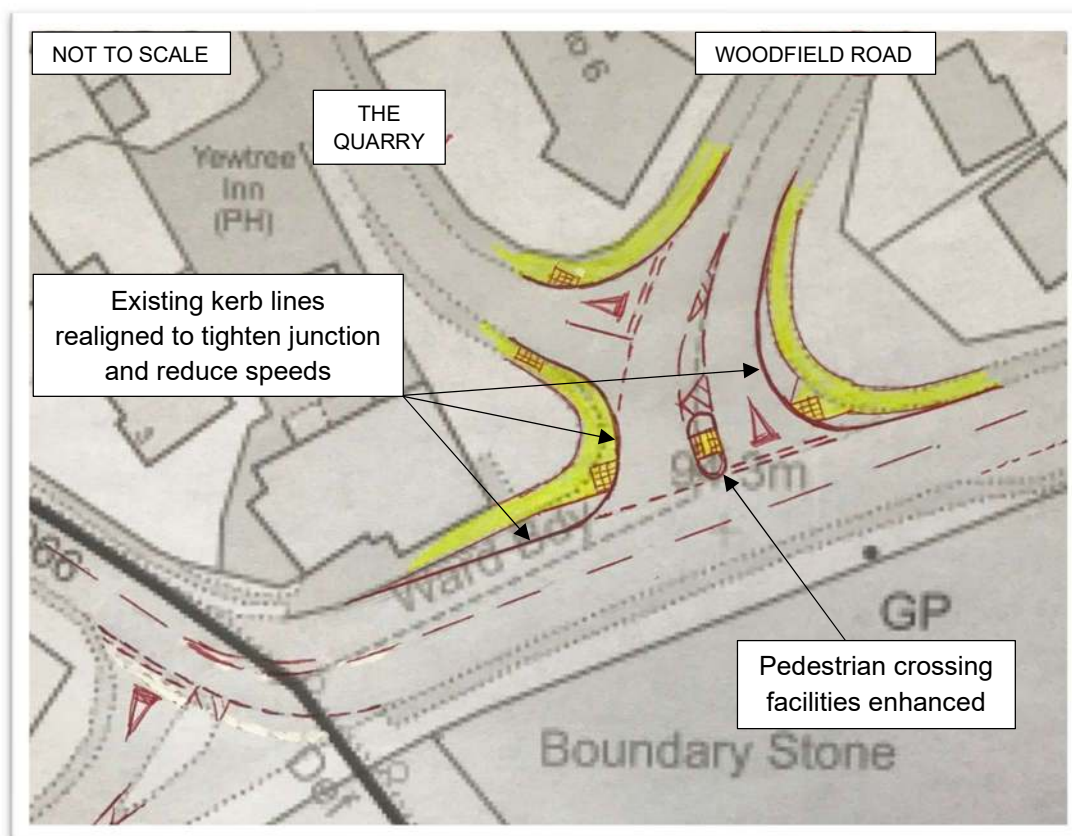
Proposed Tightening of Woodfield Road Junction
